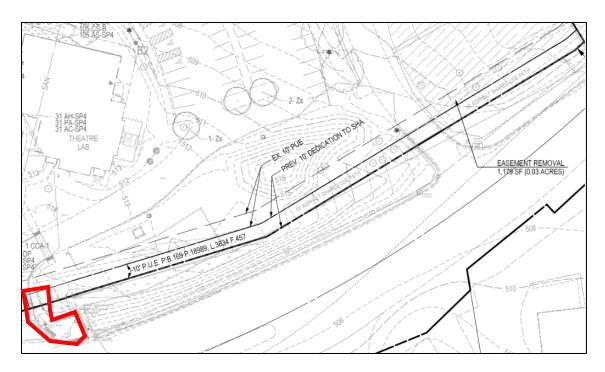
Previously Approved 30% Design for Frontage Sidepath with Red Area to be Revised
